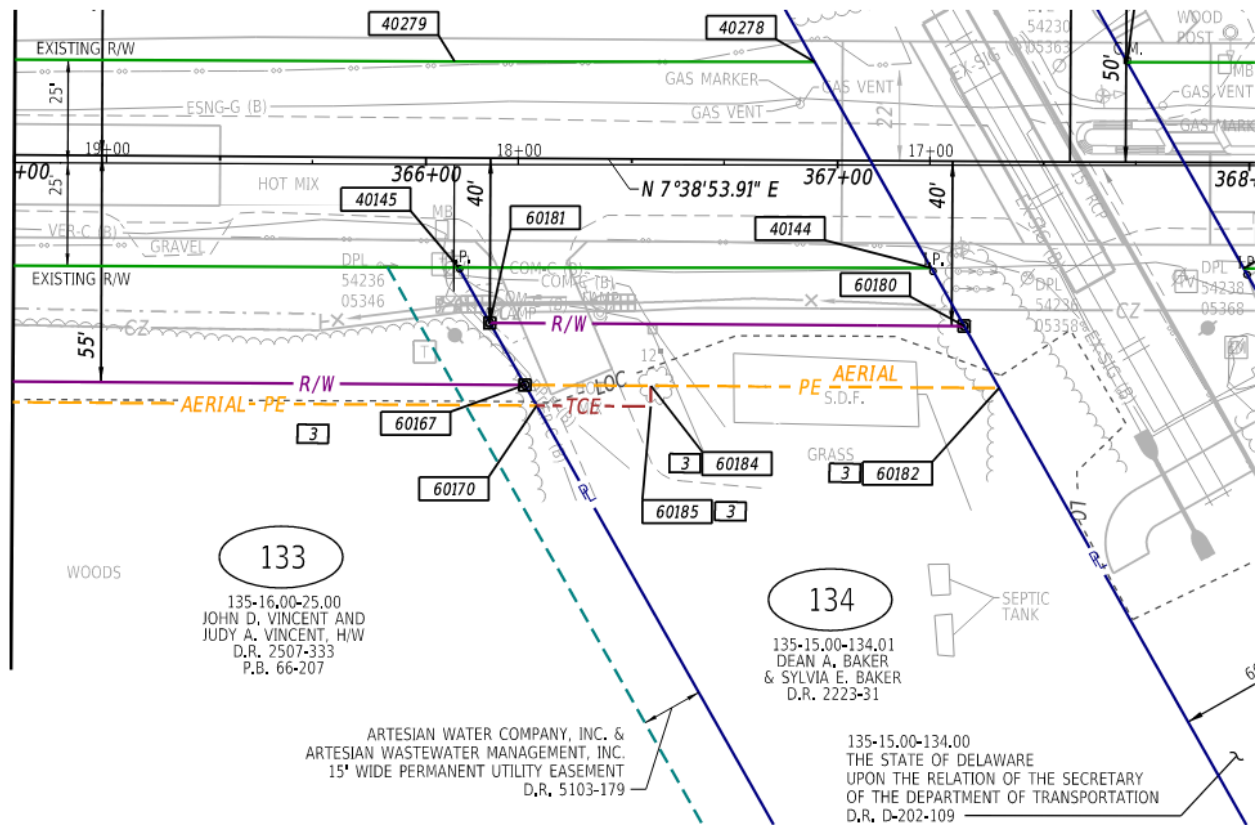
9 Example of AERIAL PE text on R/W Plans.
